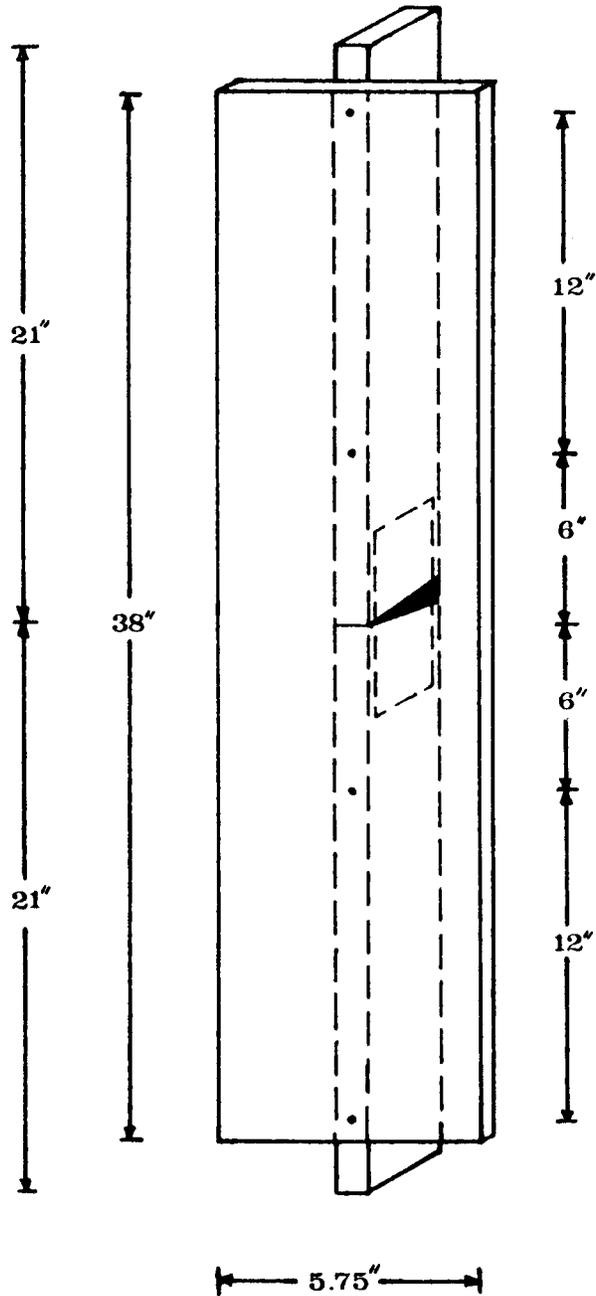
Roof truss joint specimen. Gap is shown out of scale for clarity.
